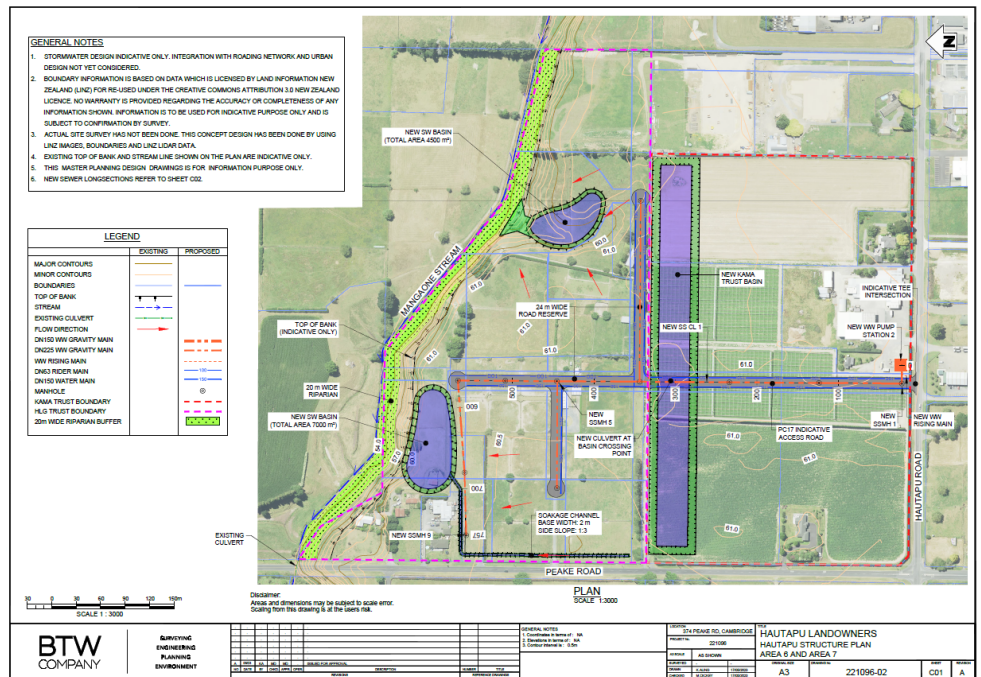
Hautapu Structure Plan for Area 6 and Area 7
